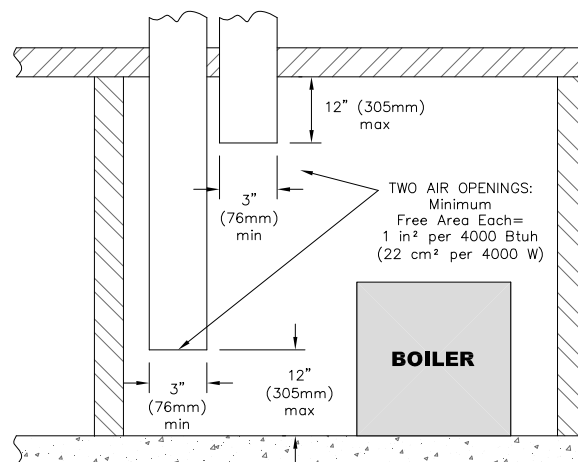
Air Openings – All Air from Outdoors through Vertical Ducts
